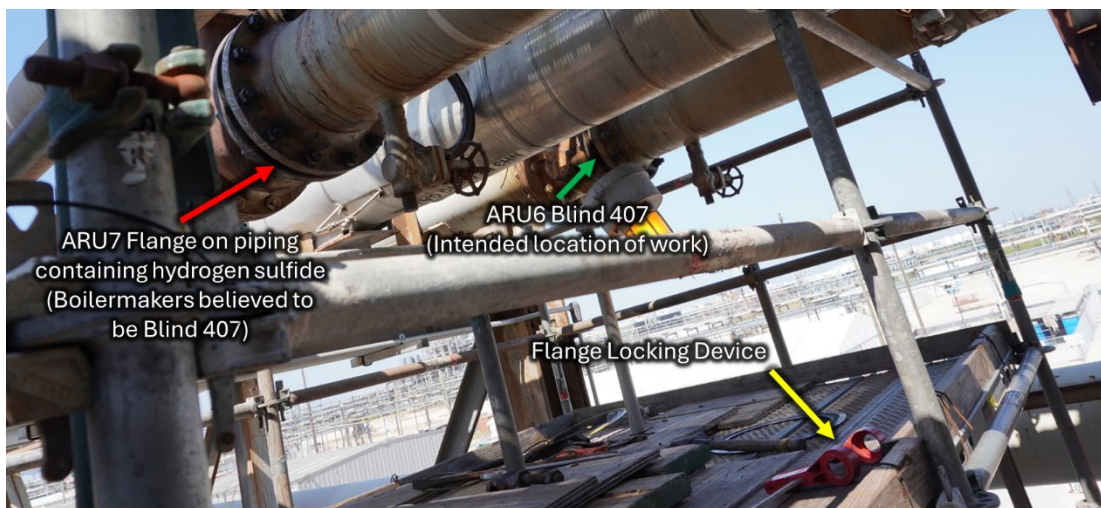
Adjacent ARU6 and ARU7 acid gas piping flanges. A flange locking device was found on the work scaffold underneath the ARU7 acid gas piping flange. (Credit: CSB)
